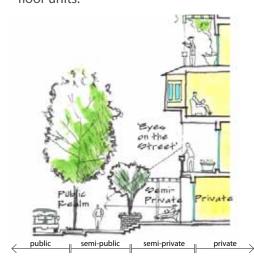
Residential buildings with 'doors on the street' (entries and stoops directly accessible from the fronting street) and upper storey balconies overlooking the street enhance street activity and safety.
